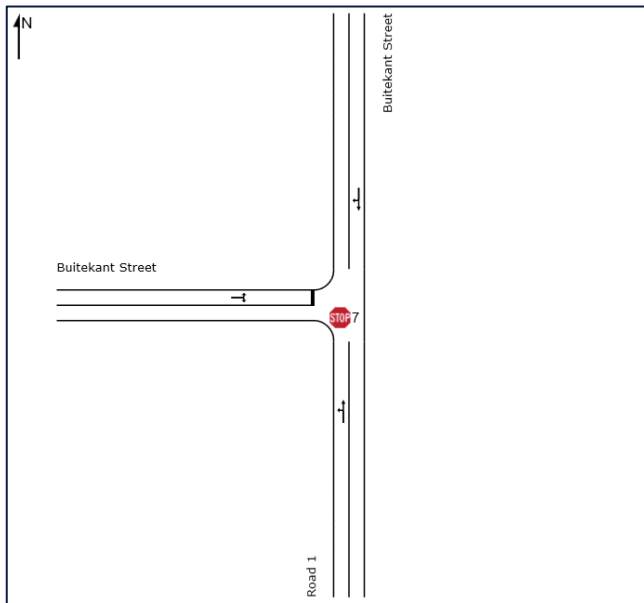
Buitekant Street and Road 1: Proposed Layout
